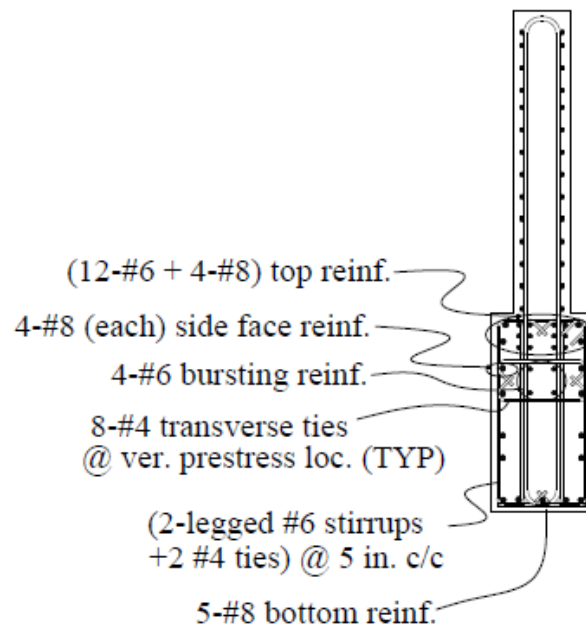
Section details for wall and foundation (Walls 2 and 3)
